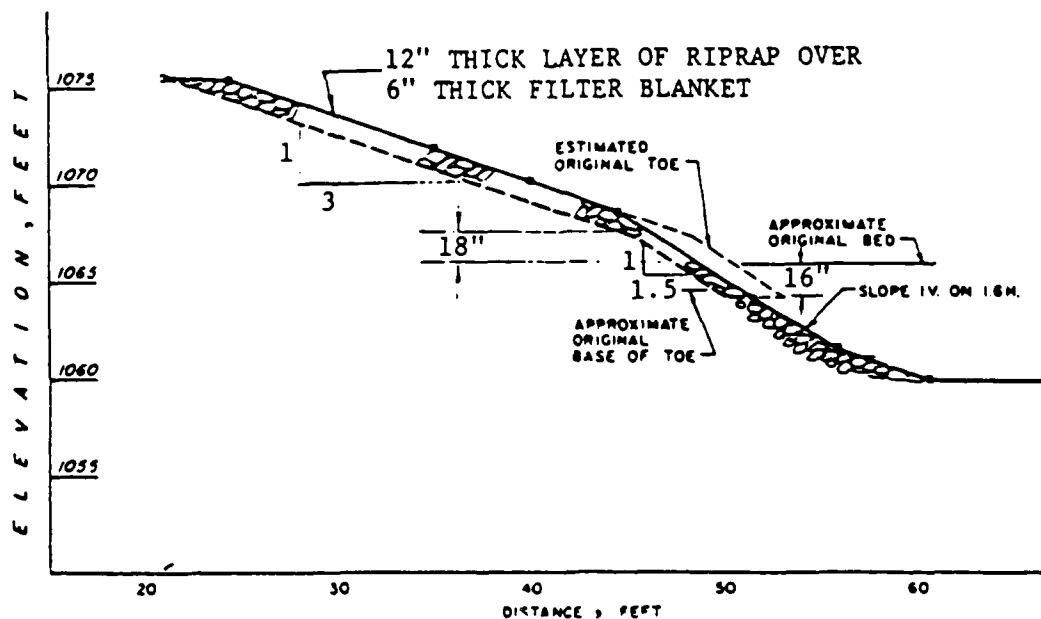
Republican River at Milford Dam Outlet Channel, Kans. Cross-sectional view of Test Section 2 shown as constructed in 1969 and as surveyed in 1974.
